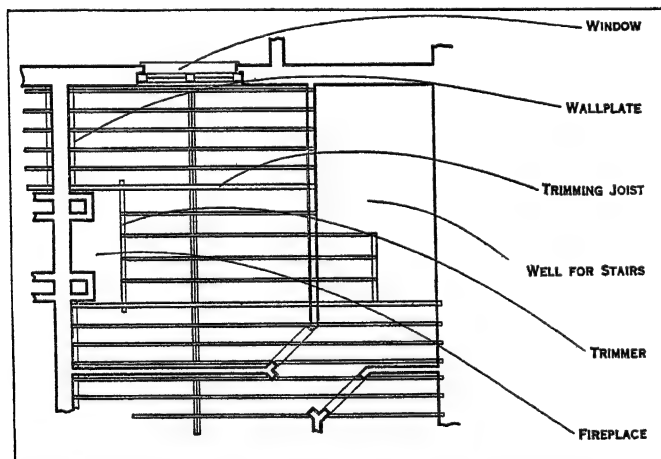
SINGLE FLOOR, IN WHICH THE FLOOR BOARDS REST ON ONE ROW OF WOOD JOISTS
